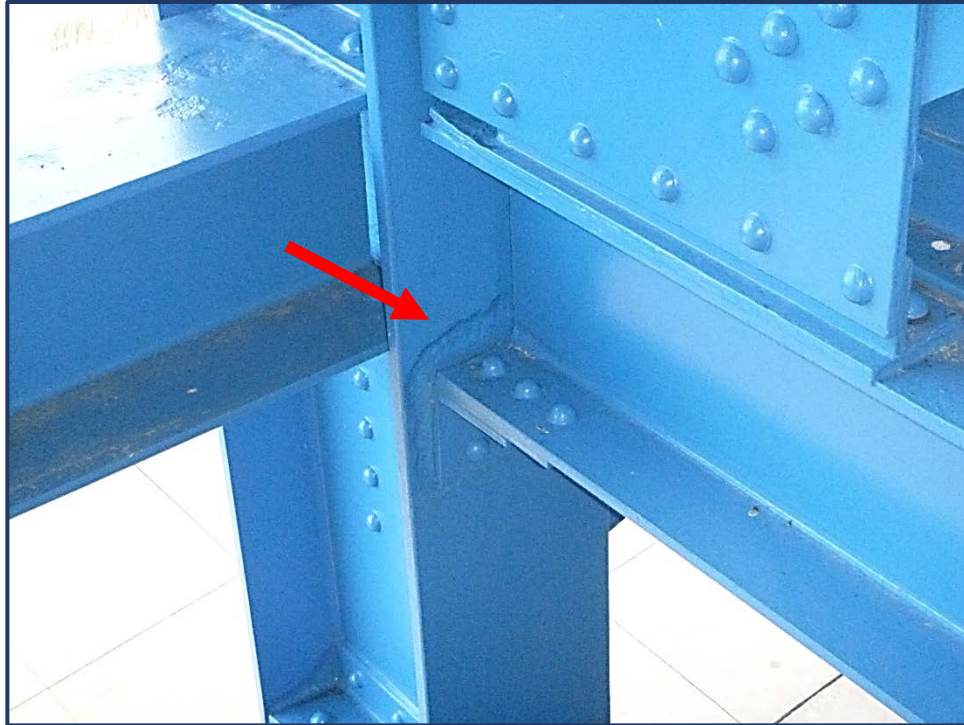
Unit III, Bent 5 North Column, Painted Over Section Loss at Bracing Connection
